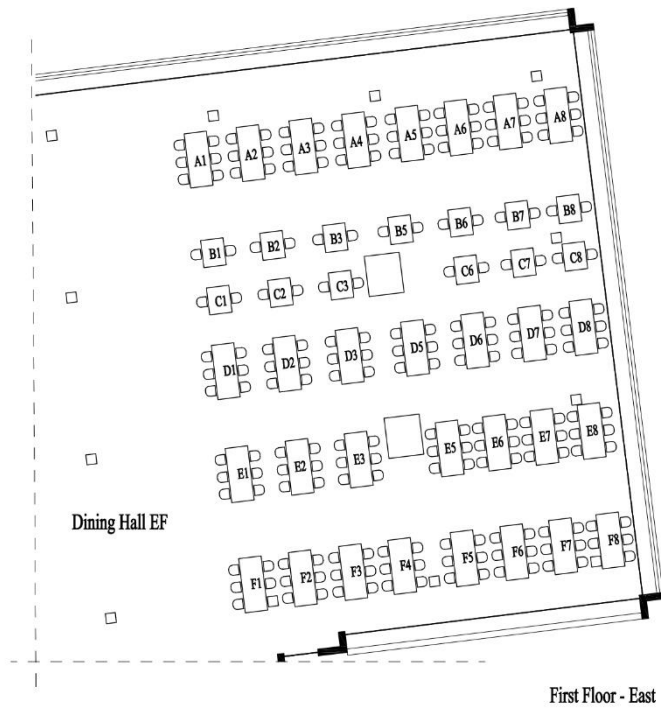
First Floor Plan and Temperature Data Notation of East Dining Hall
